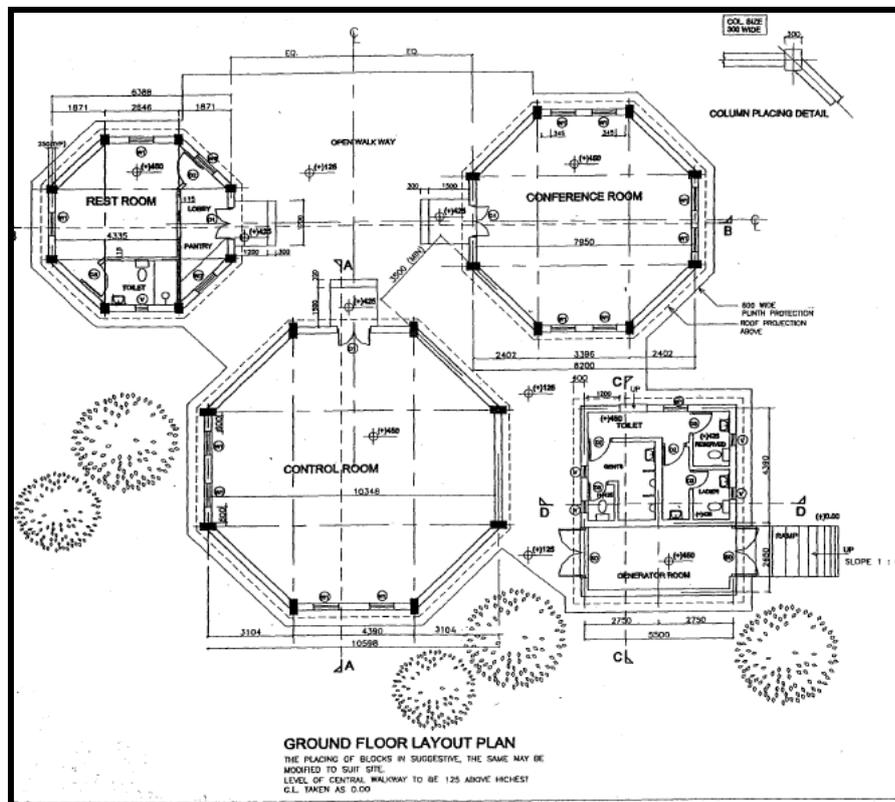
Indicative layout plan of existing SEOC building at Old secretariat, Patna
